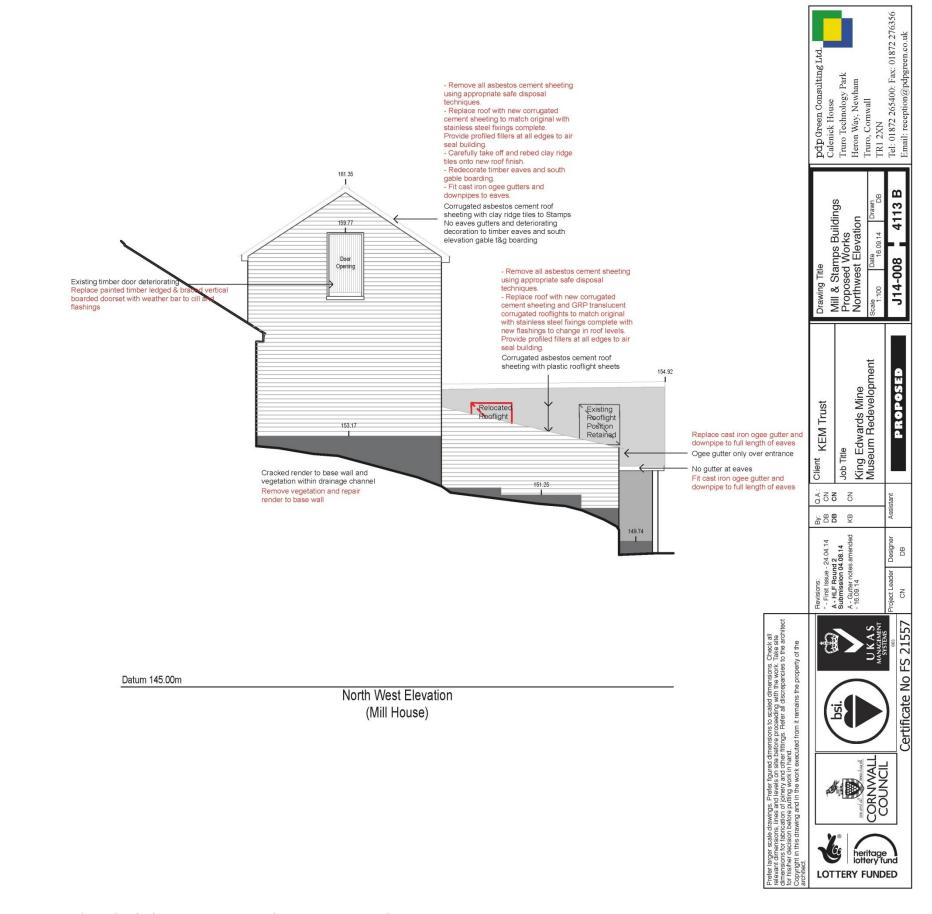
North west elevation of the Mill and Stamps proposed works (PdP Green Cons. Ltd Dwg No. 4113B)
